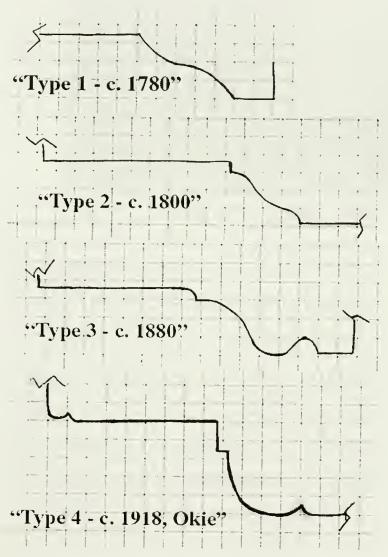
Molding Profiles from Exterior Window Trim of Main House, 2002
